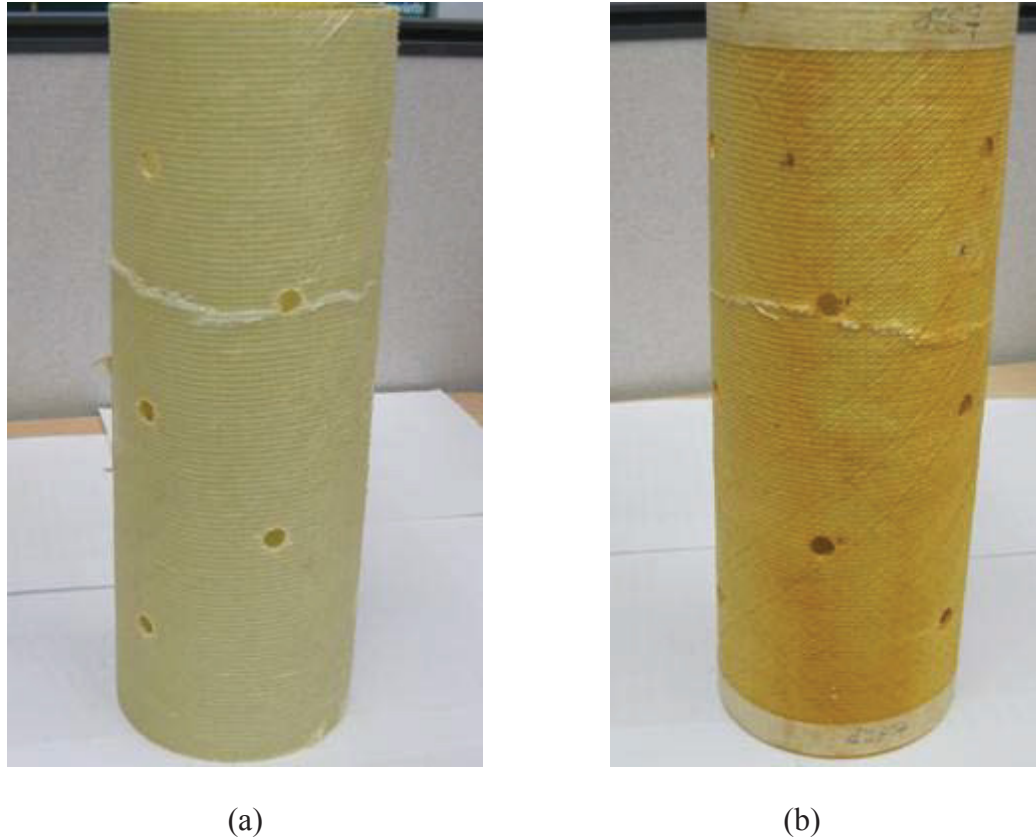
Typical failure patterns a) un-aged specimen b) aged specimen
